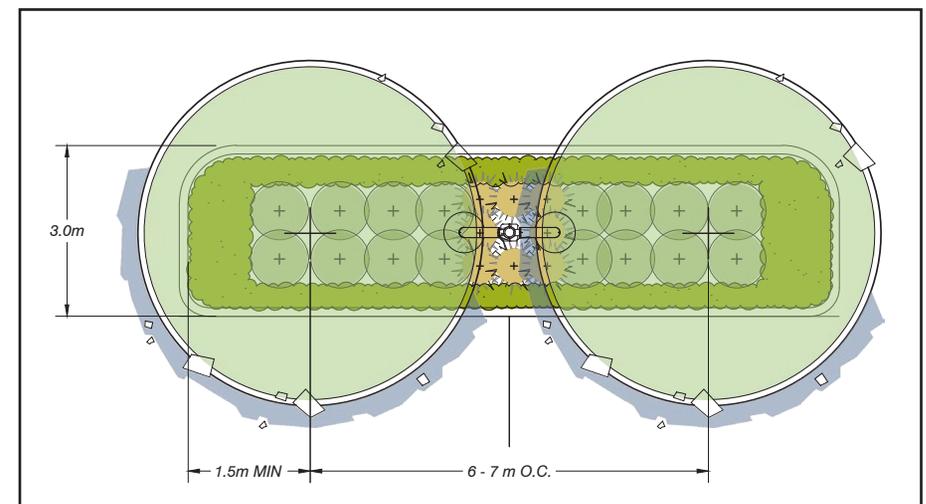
Landscaped island with minimum width of 3metres in parking lot
